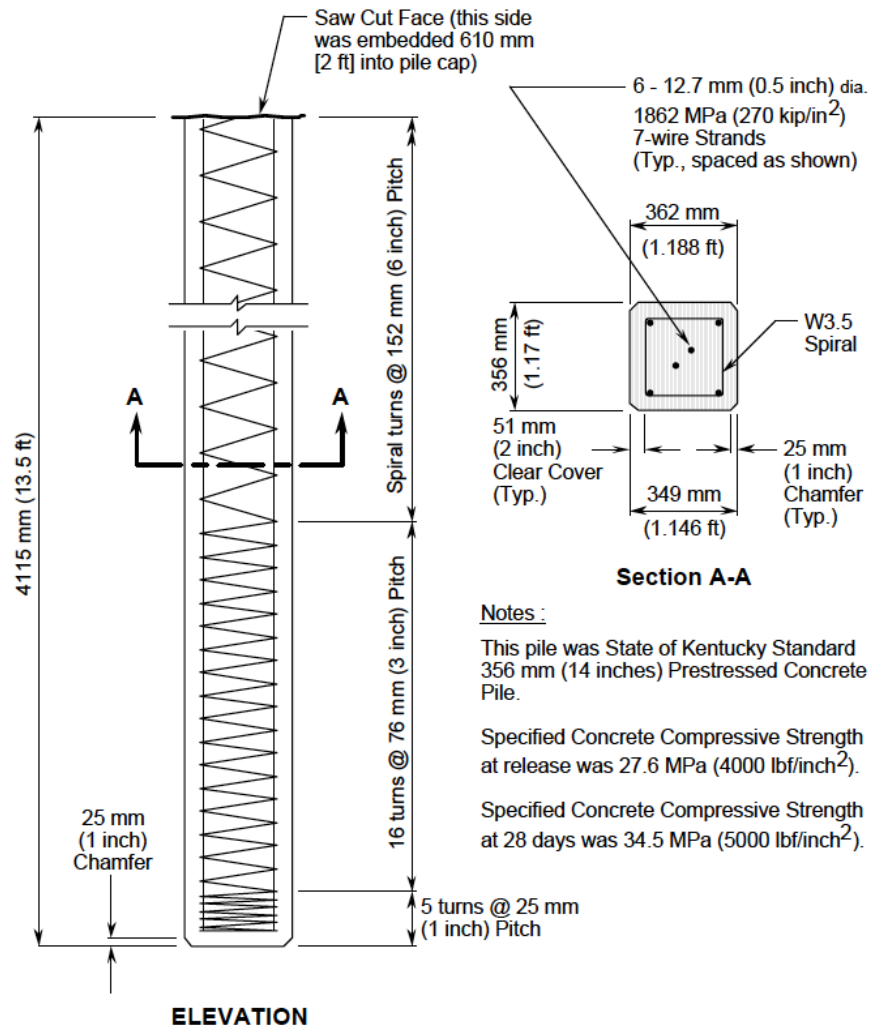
Design details for prestressed concrete pile (Tabatabai, Oesterle and Lawson 1999).
